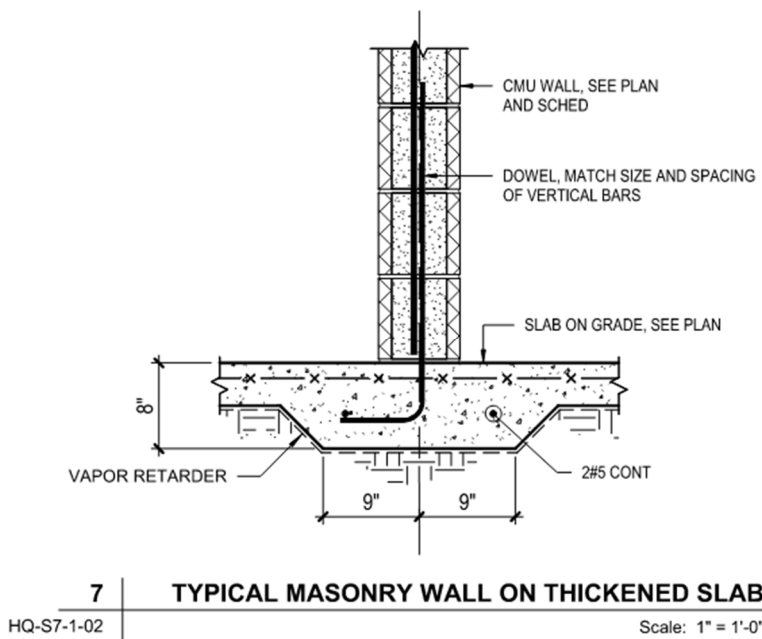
Detail 7 from Sheet HQ-S7-1-02 which shows CMU wall bearing on thickened slab-on-ground. Note that there is a vapor retarder under the slab-on-ground supporting the partition masonry walls
